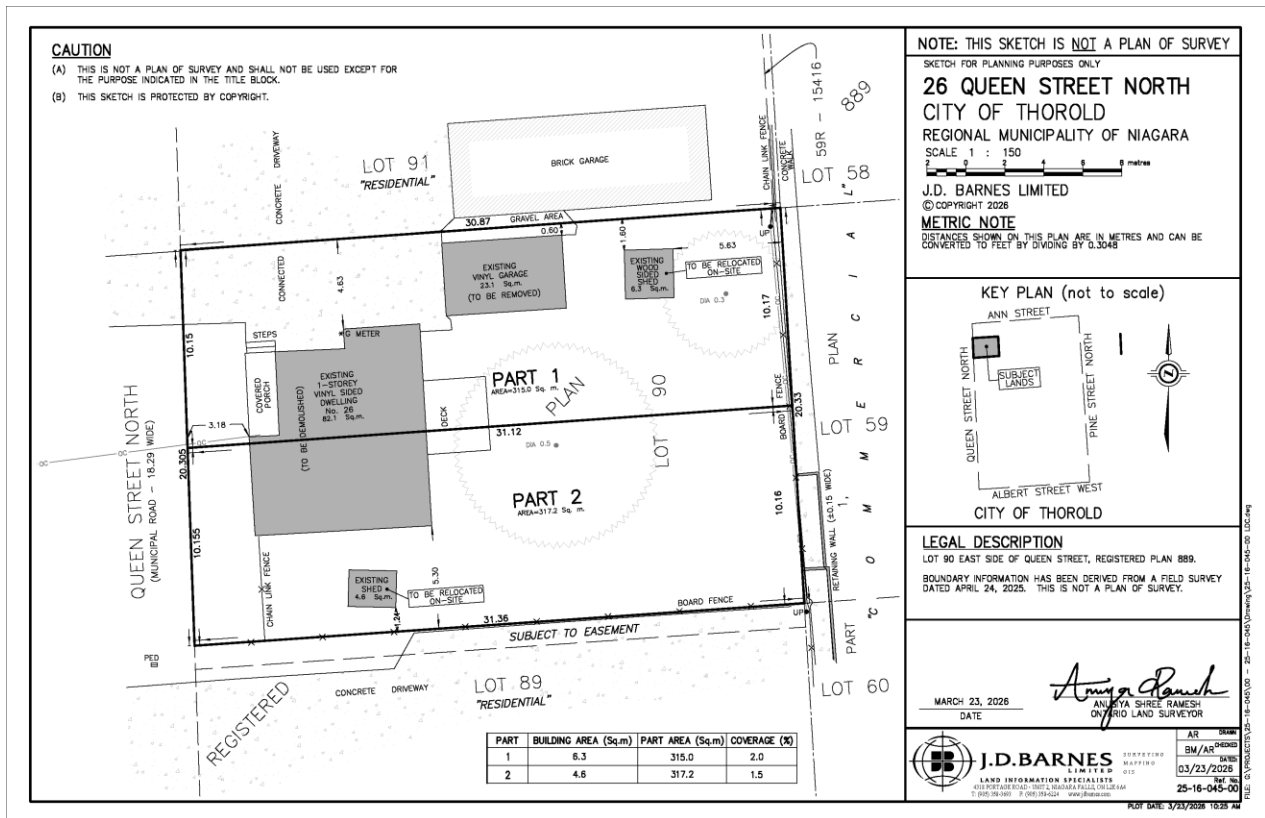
Proposed severance plan showing buildings to be demolished or removed.
